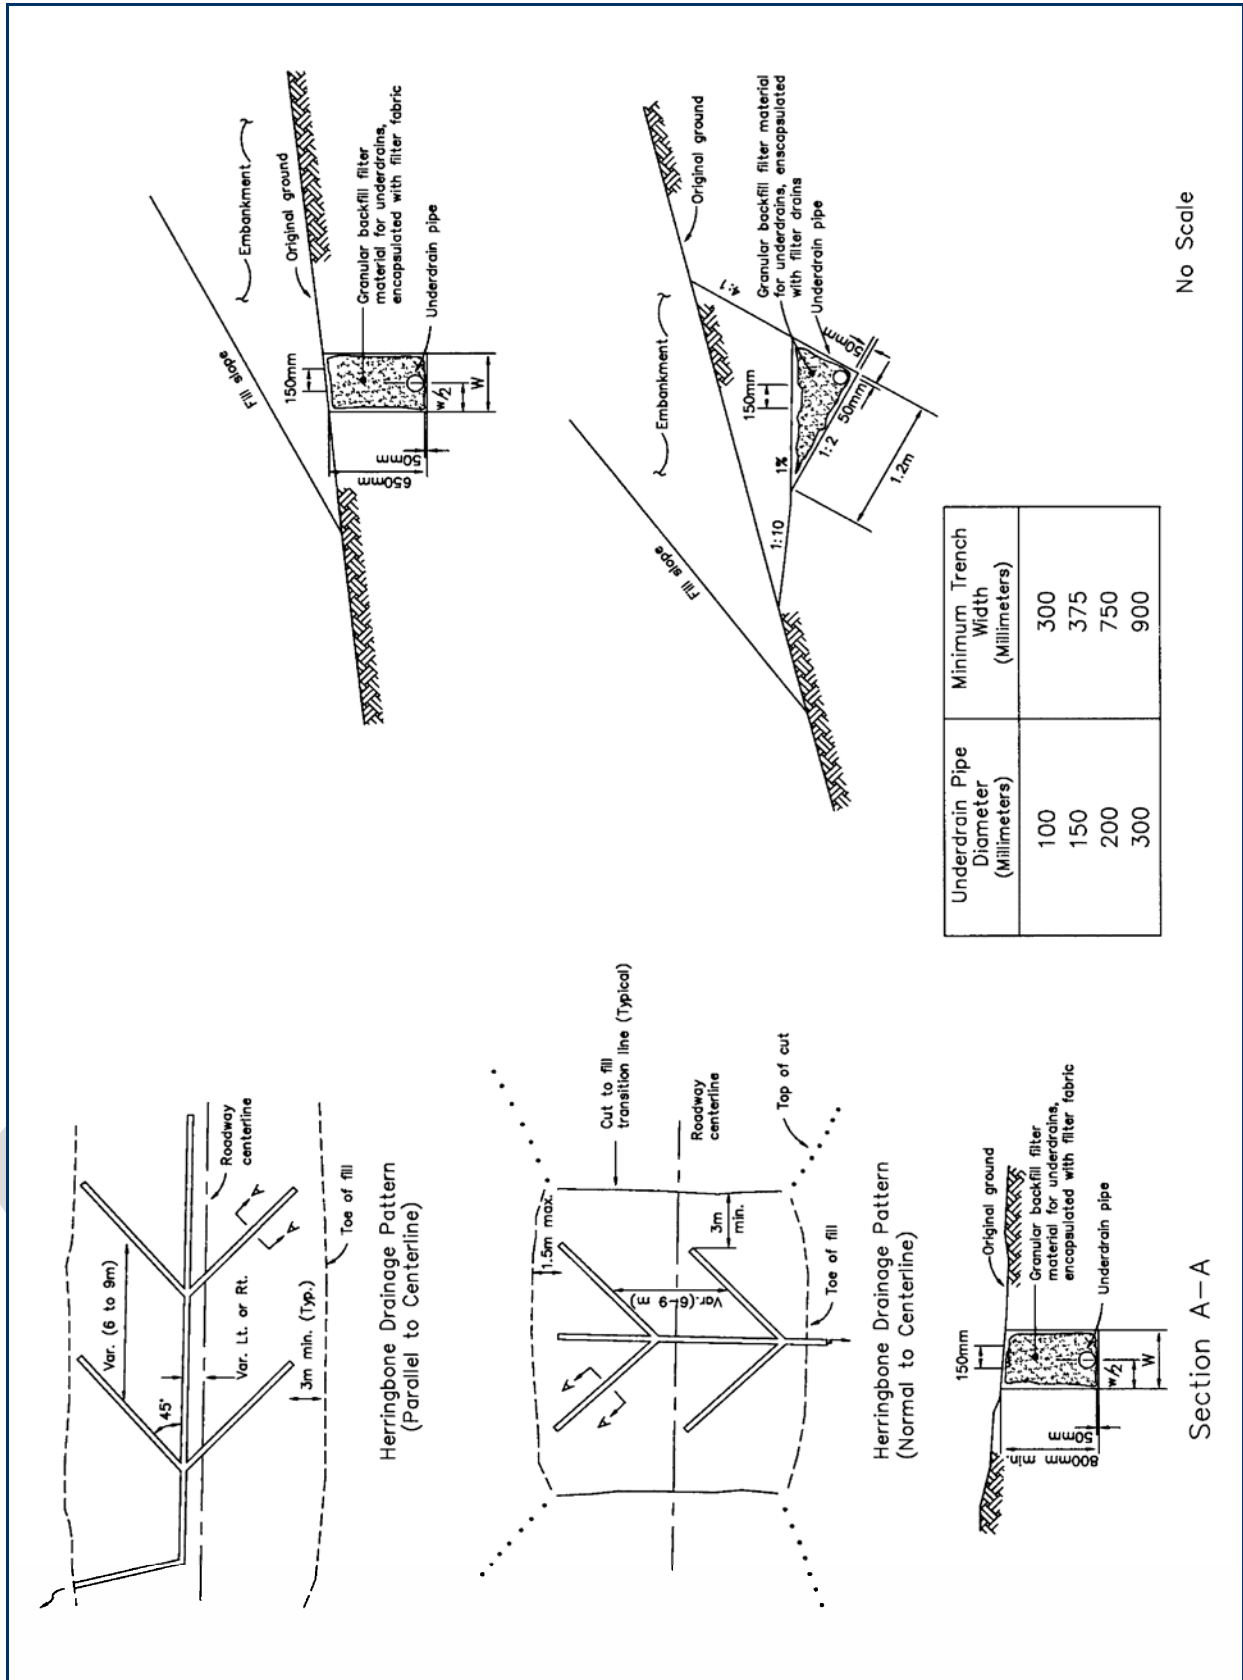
C TYPICAL UNDERDRAIN INSTALLATION BENEATH THE ROADBED (Metric)
